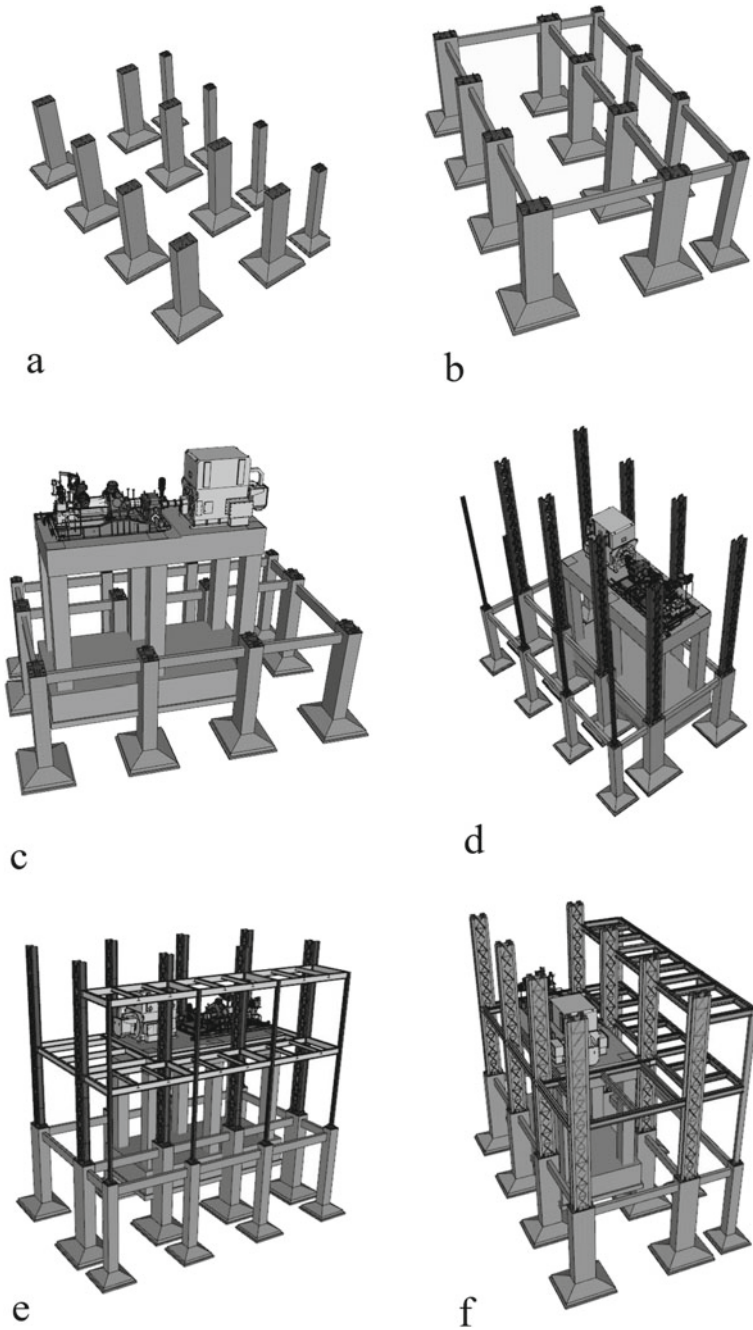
Structure installation sequence—a Foundation, b Plinth beams, c R.C.C. foundation and pedestal for steam generator, d Fabrication and erection of steel columns, e Fabrication and erection of beams, and f Application of cementous fire proofing
